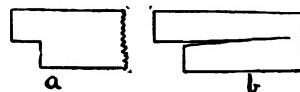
Cutting Ends of Joists in Cheap Construction.
